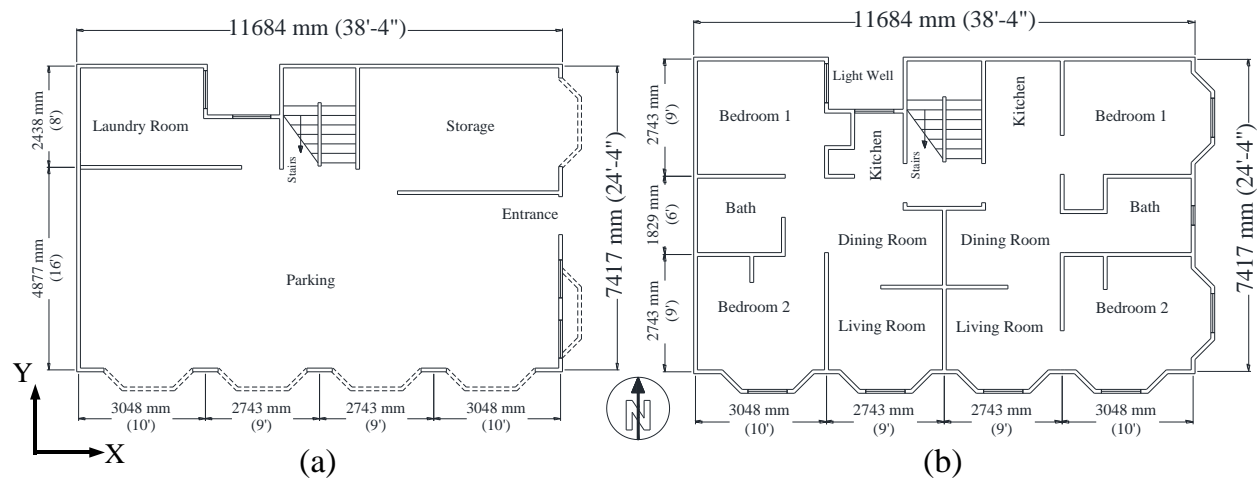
Floor plan views of the four-story test building: (a) first story, and (b) upper stories
